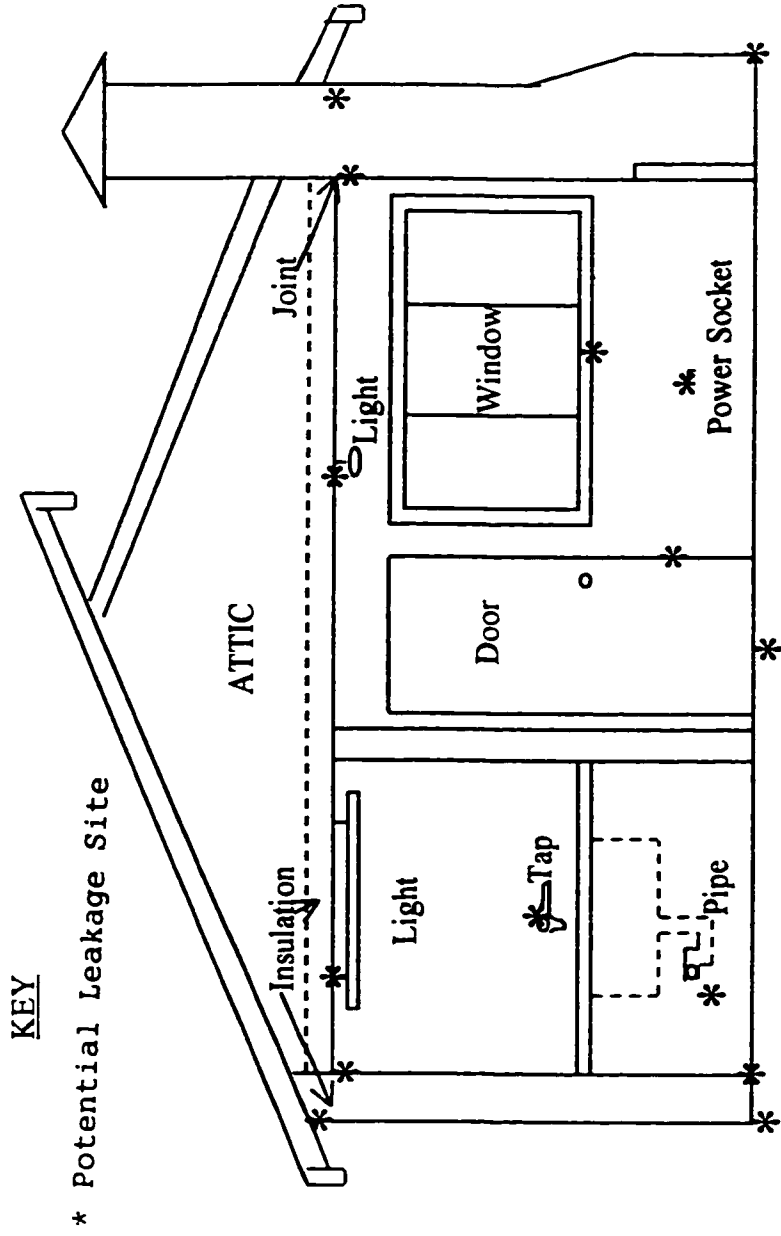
Sketch of Building Envelope Showing Some Potential Leakage Sites.
